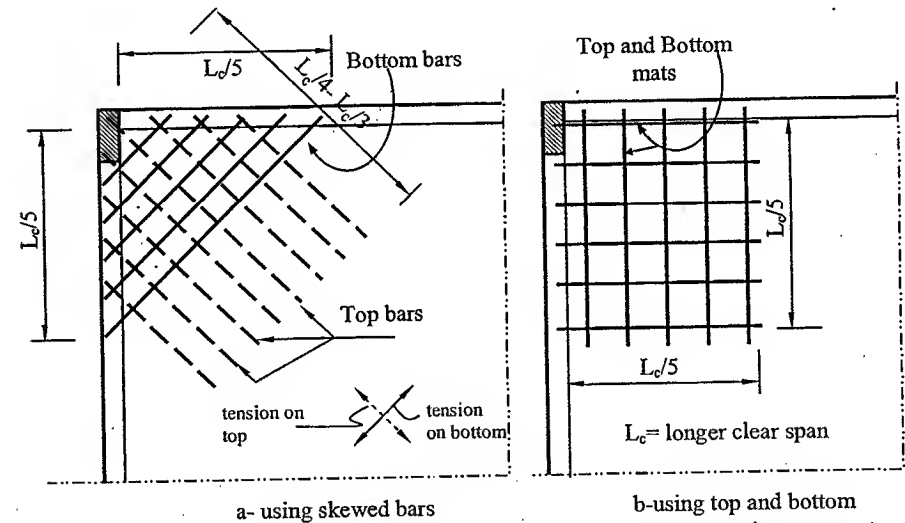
Corner reinforcement at an exterior two-way slab
